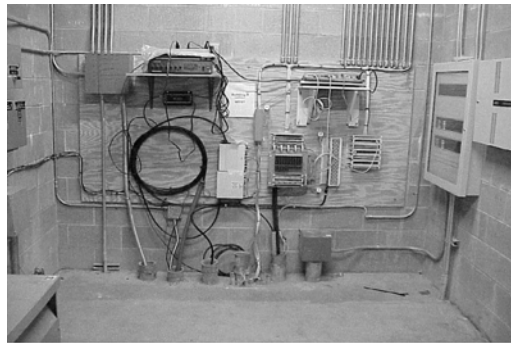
EXISTING WEST WALL COMMUNICATIONS BACKBOARD
